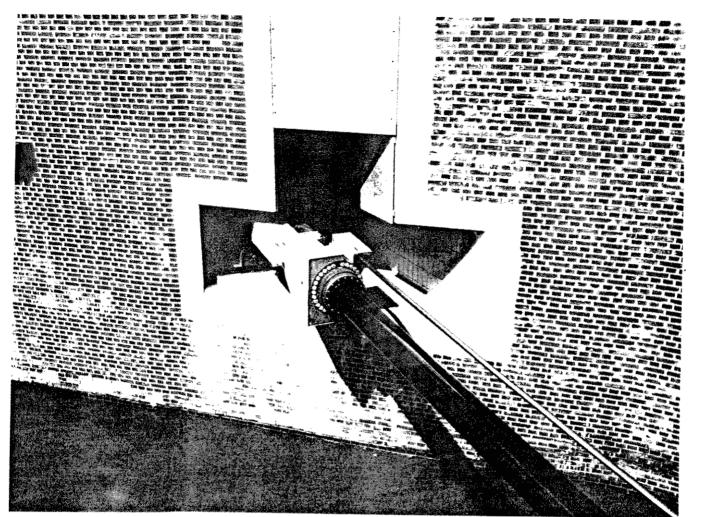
Brunsbüttel lock • drive cylinder for mitre gate. piston rod with CERAMAX coating
